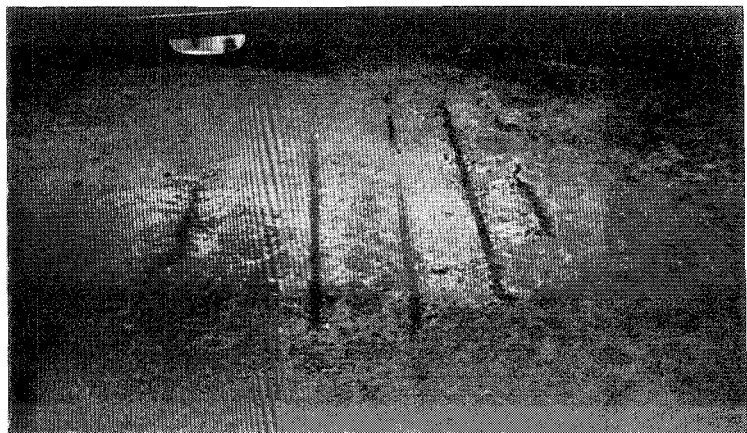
Spalling Induced by Corrosion of Reinforcement
